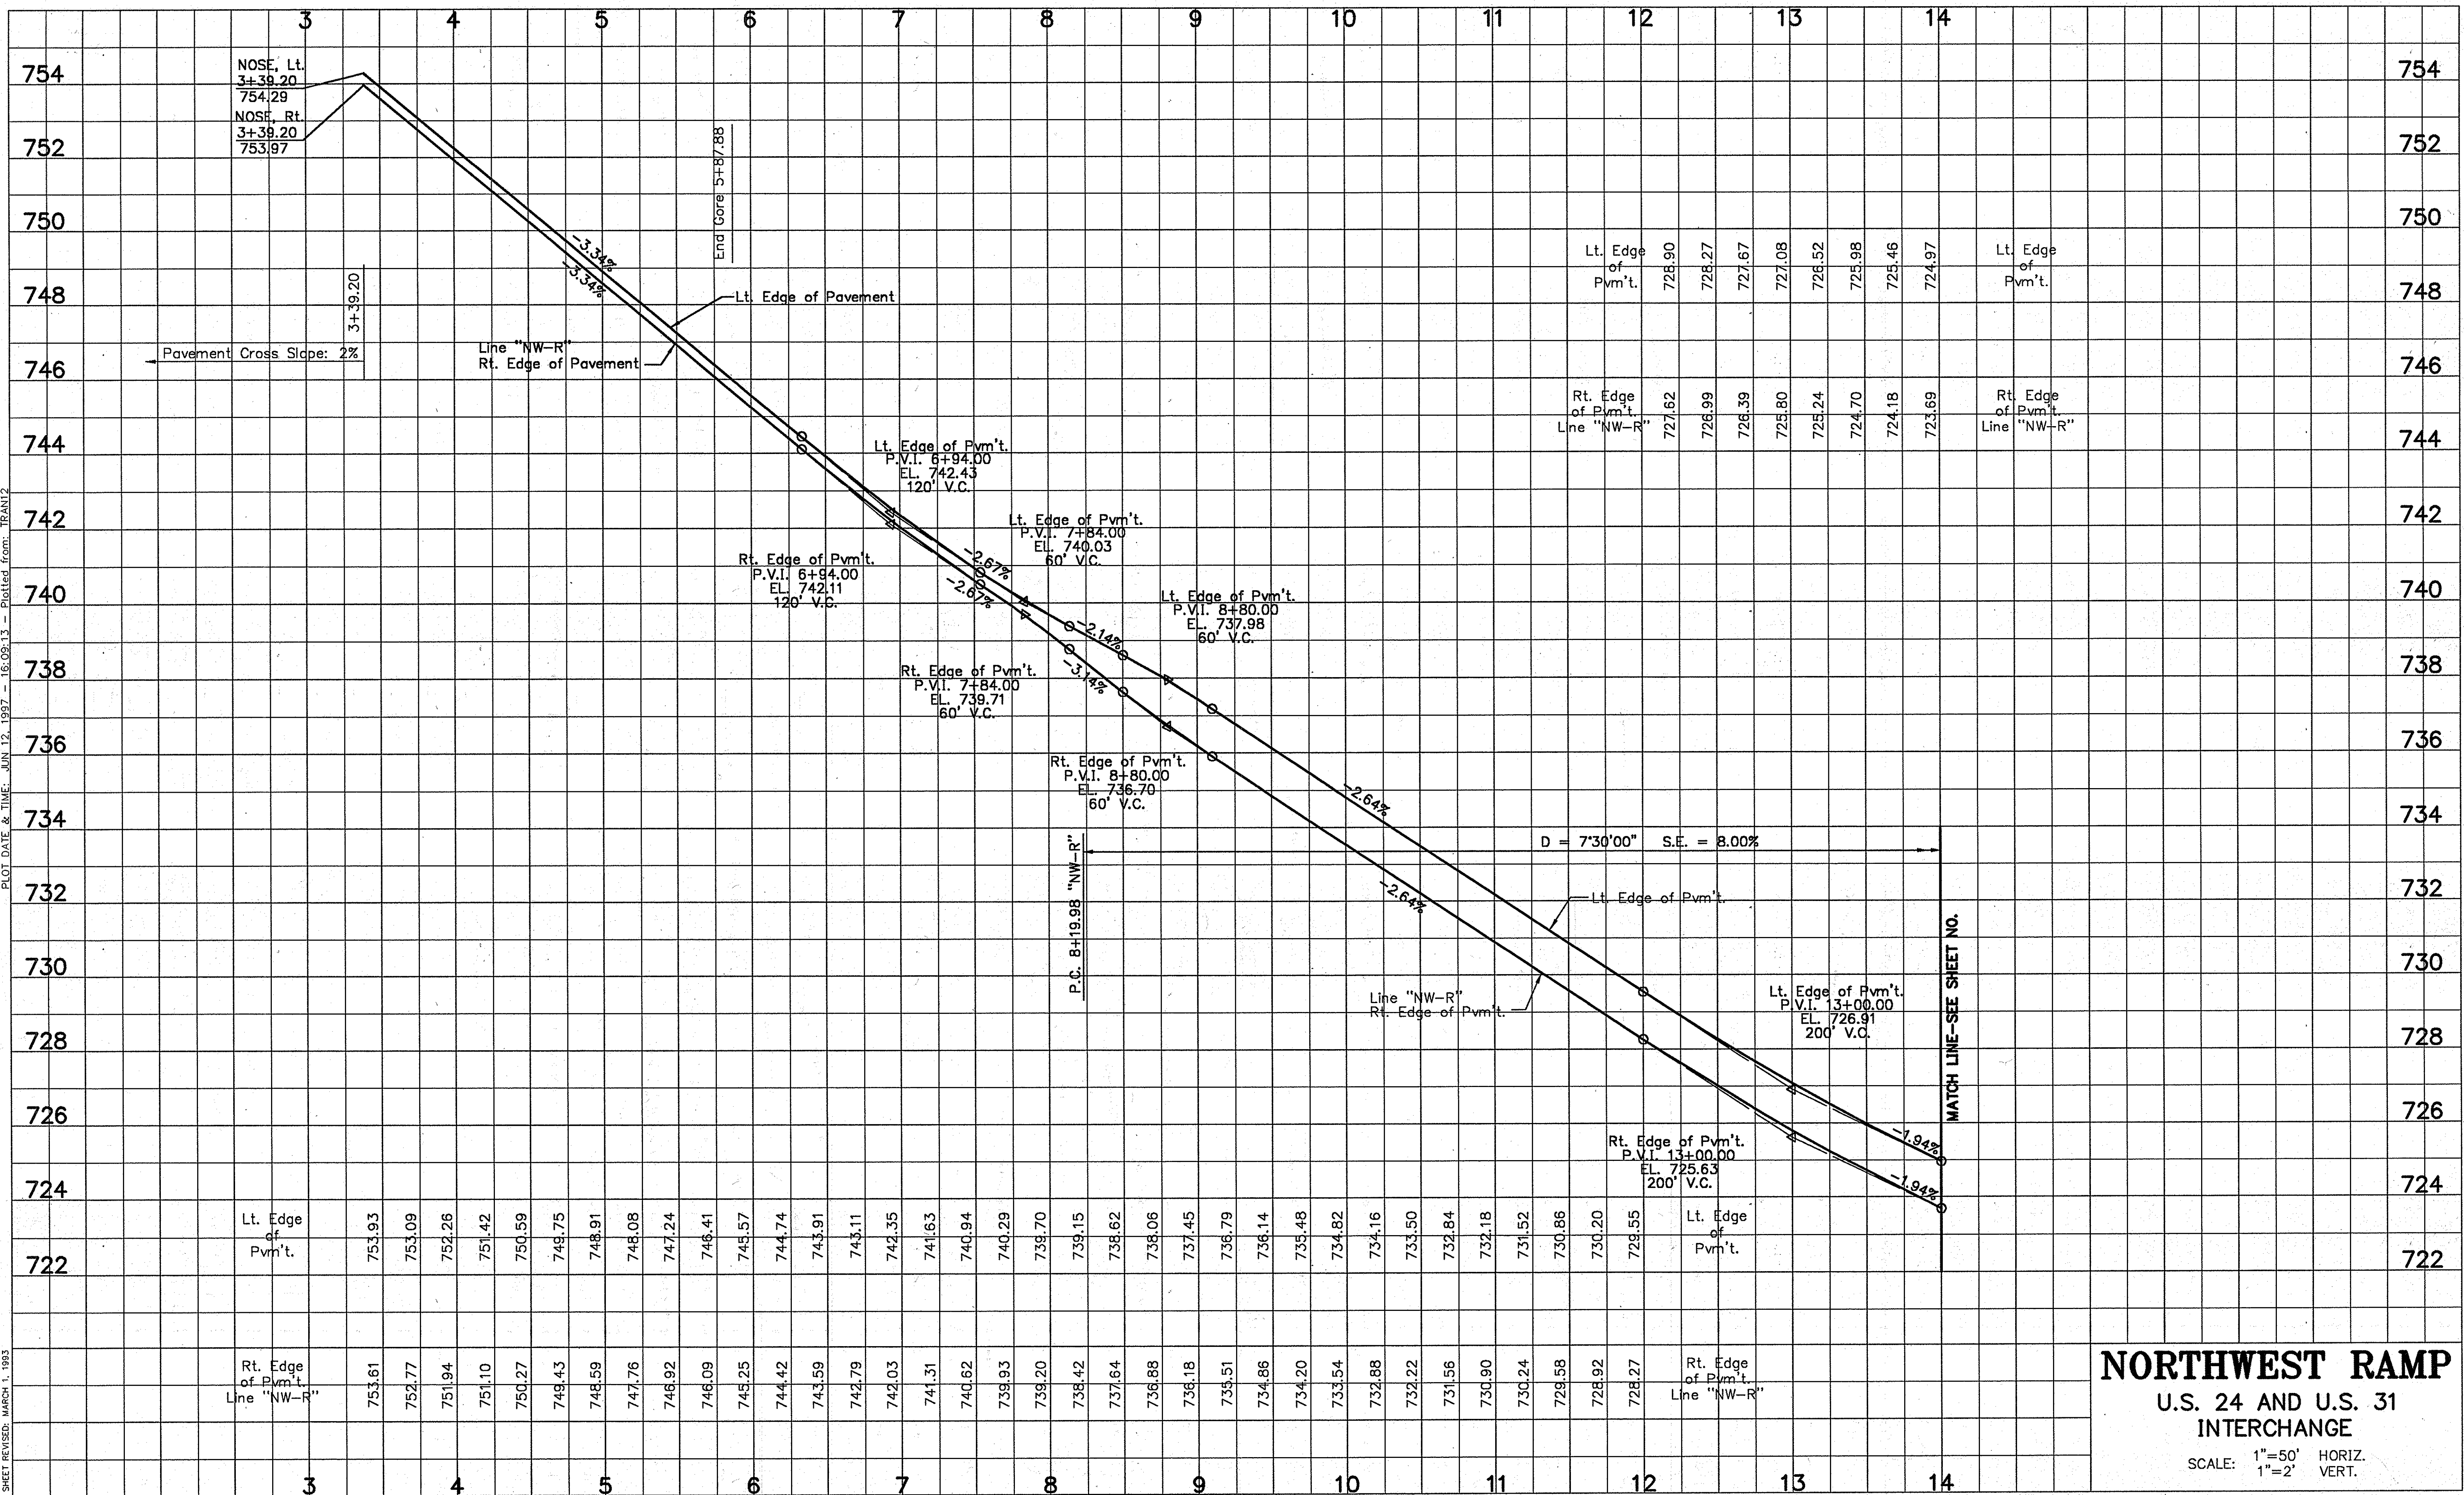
PLAN - PROFILE D. R. STANDARD 1975
